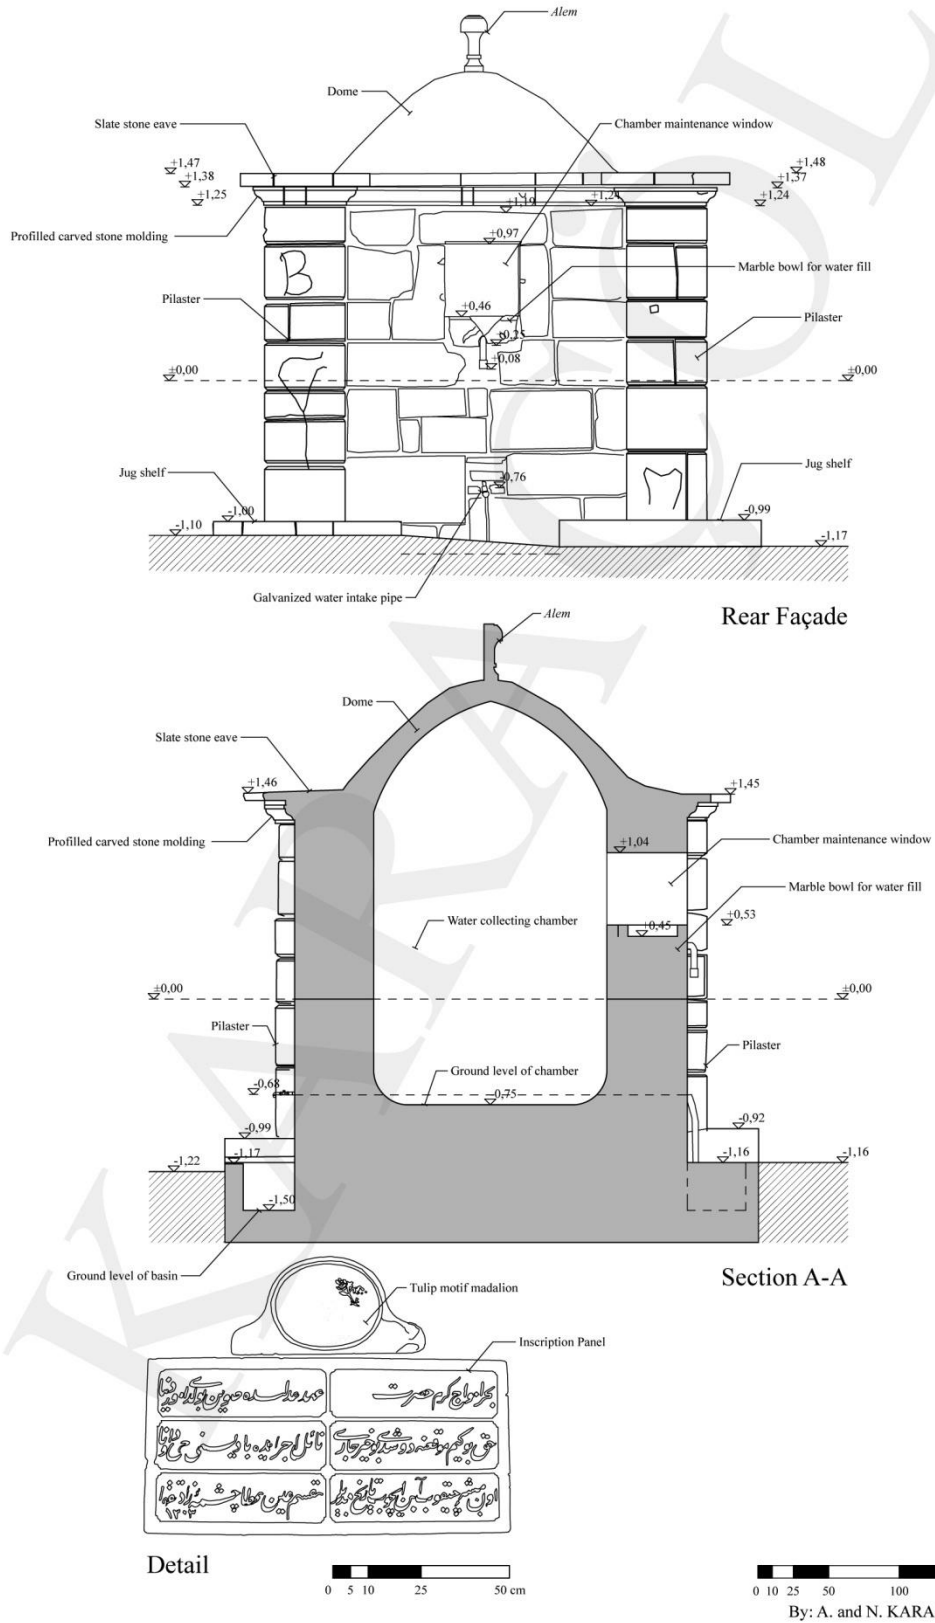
Kaymakam Fountain rear façade, section and detail drawings
